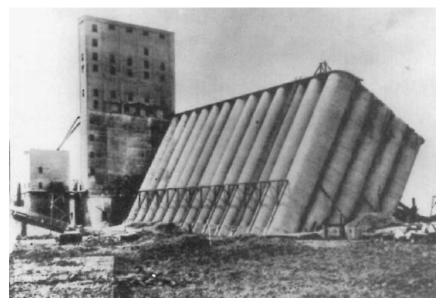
Transcona grain elevator bearing capacity failure.
